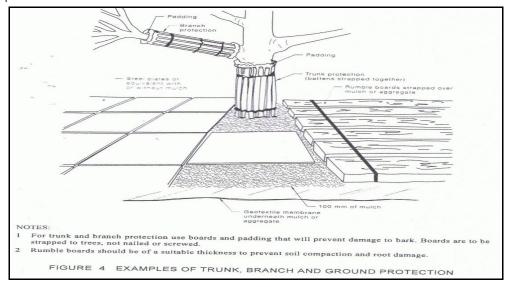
Example of Trunk, Branch & Ground Protection Measures (Extract Images from AS4970-2009.)
